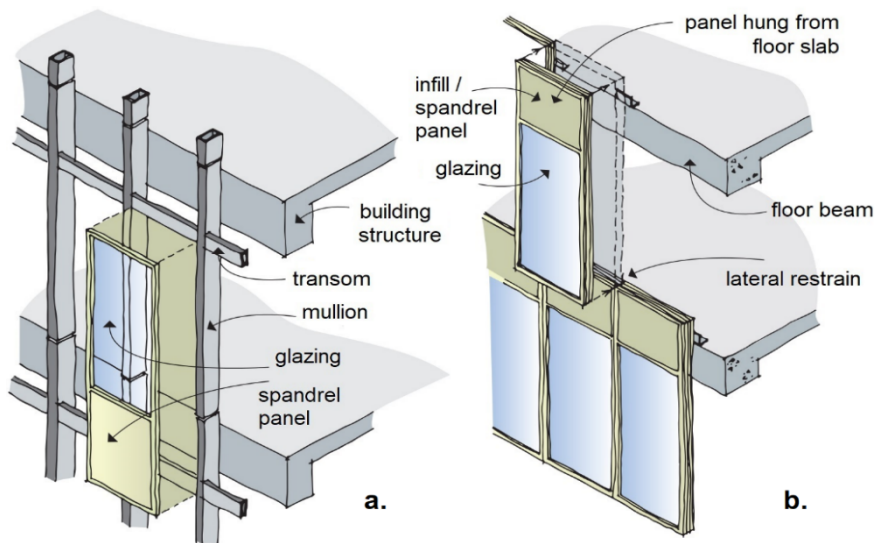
Curtain wall constructive systems: a. stick systems, b. unitised systems (Anzia, 2019).
